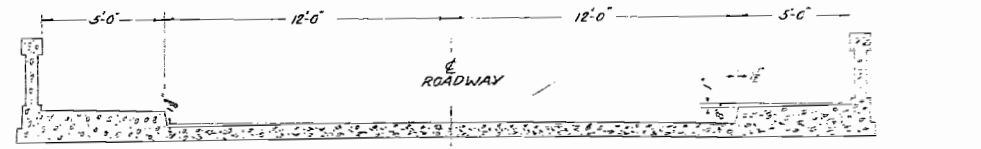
DETAIL OF SIDEWALK AND SHOULDERS AT GUTTER OUTLETS STA 692+46 TO STA 692+82
